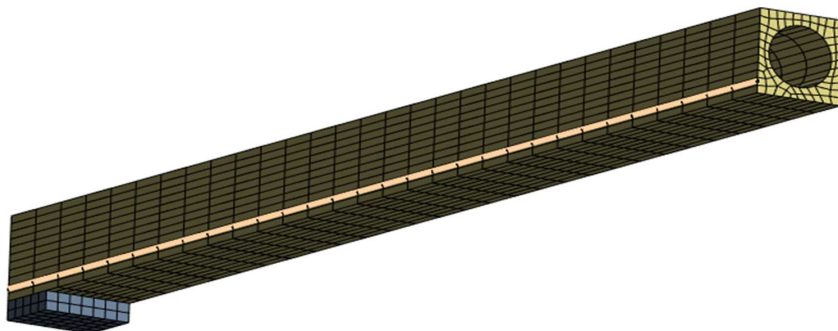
Finite element model of a fragment of a reinforced concrete hollow slab
